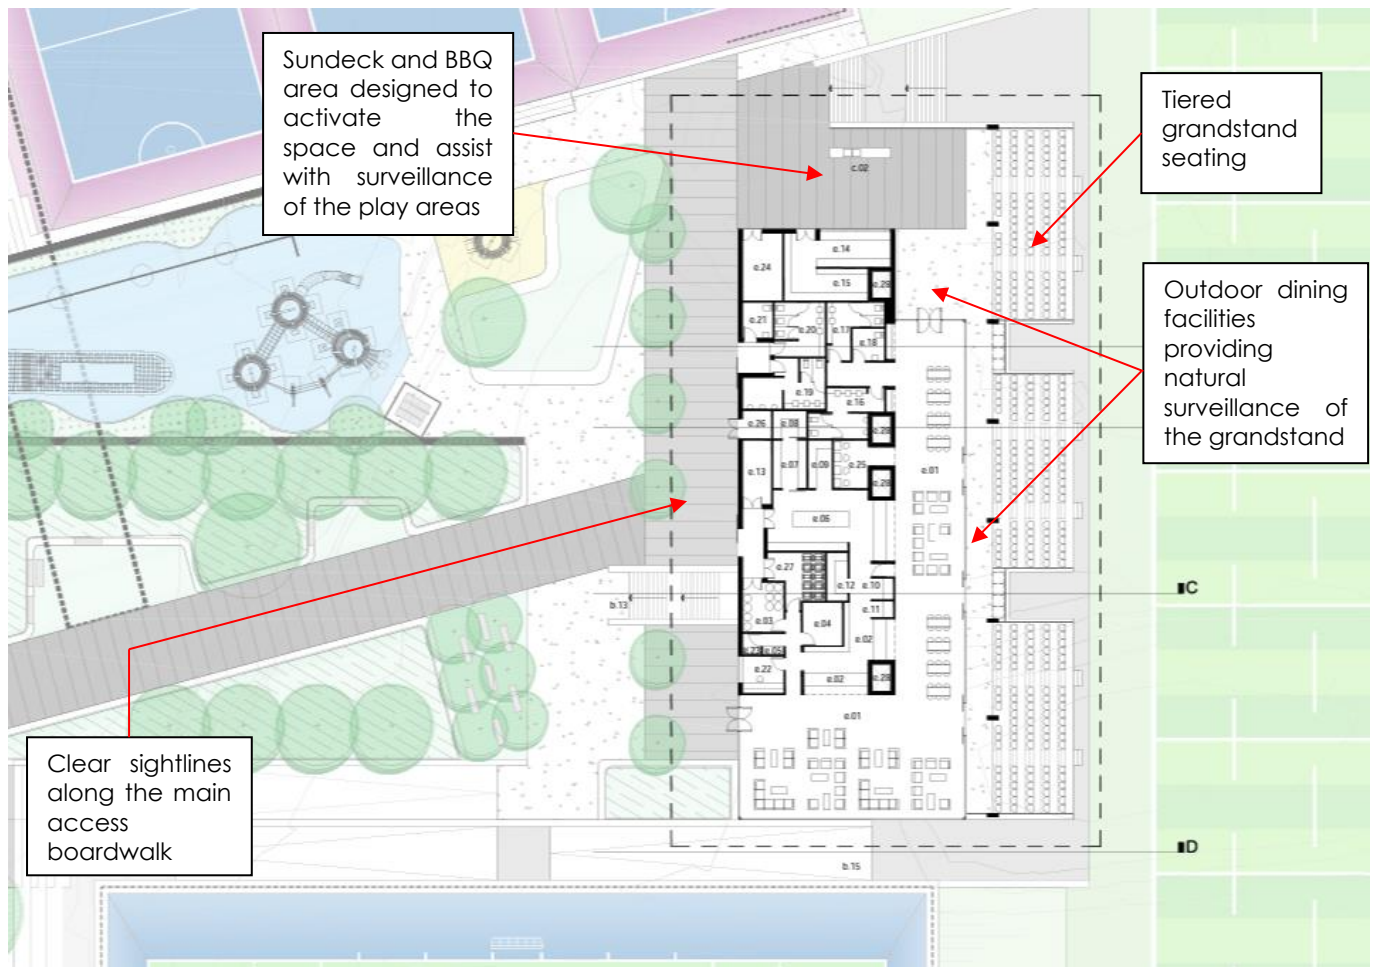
Extract from Ground Floor Plan (Crawford Architects, 2021)
